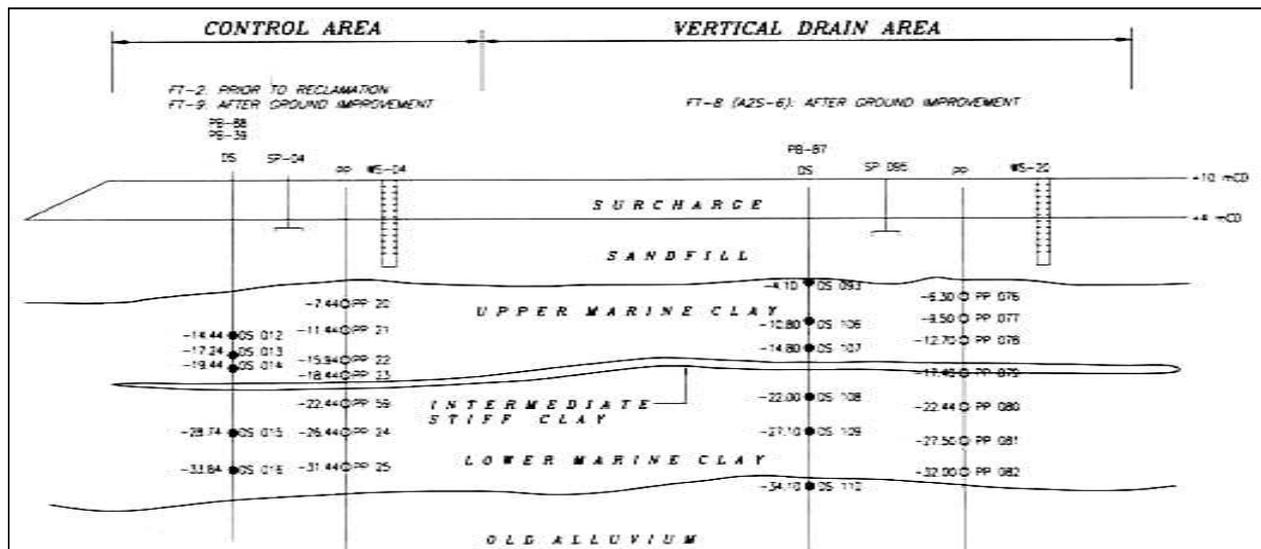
Cross sectional soil profile showing instrument elevations at the in situ test site.
